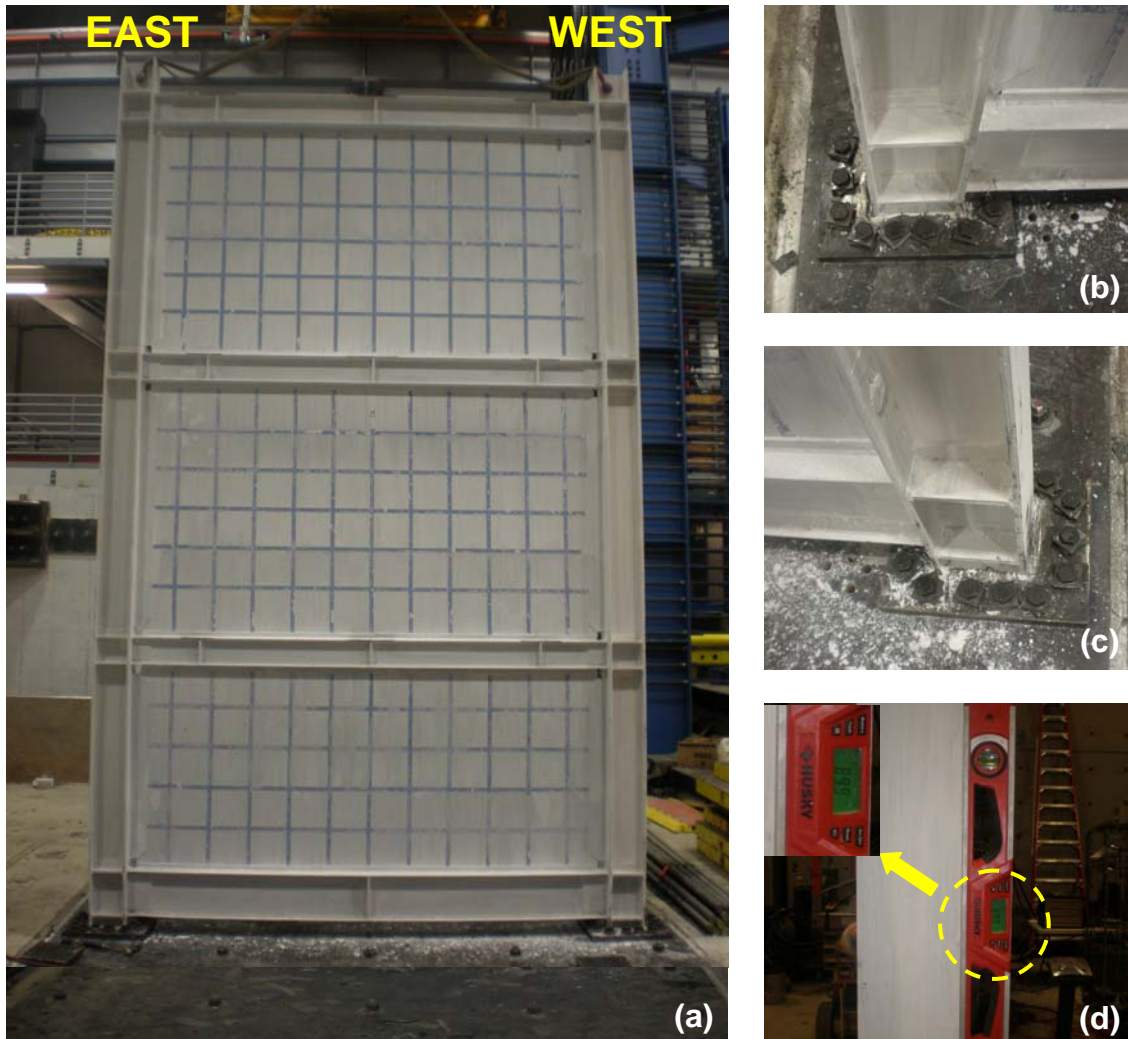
Specimen Mounting on Floor Plate: (a) Overall View; (b) East Column Base Plate; (c) West Column Base Plate; (d) Vertical Level Measurement
